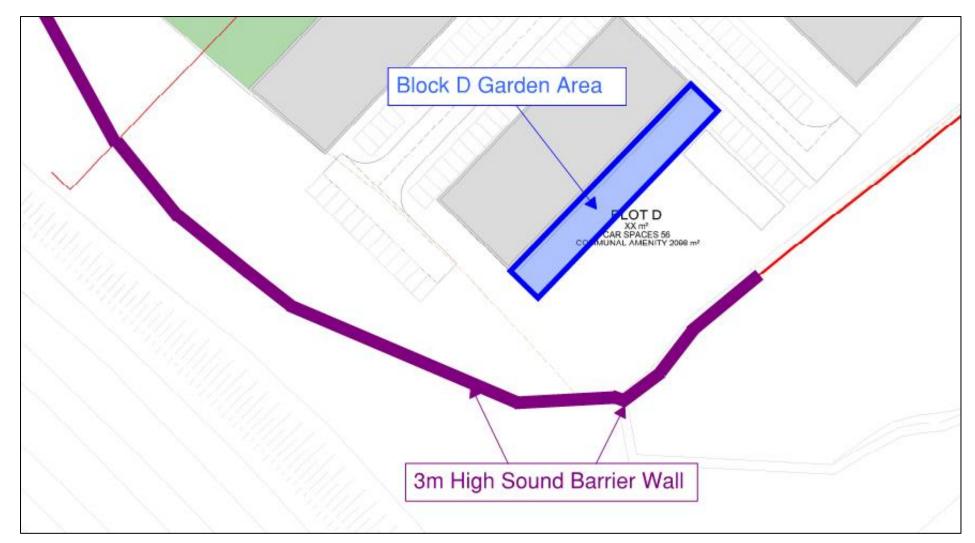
Apartment Block Garden Areas Where 2m High Perimeter Fencing Should Be Provided
